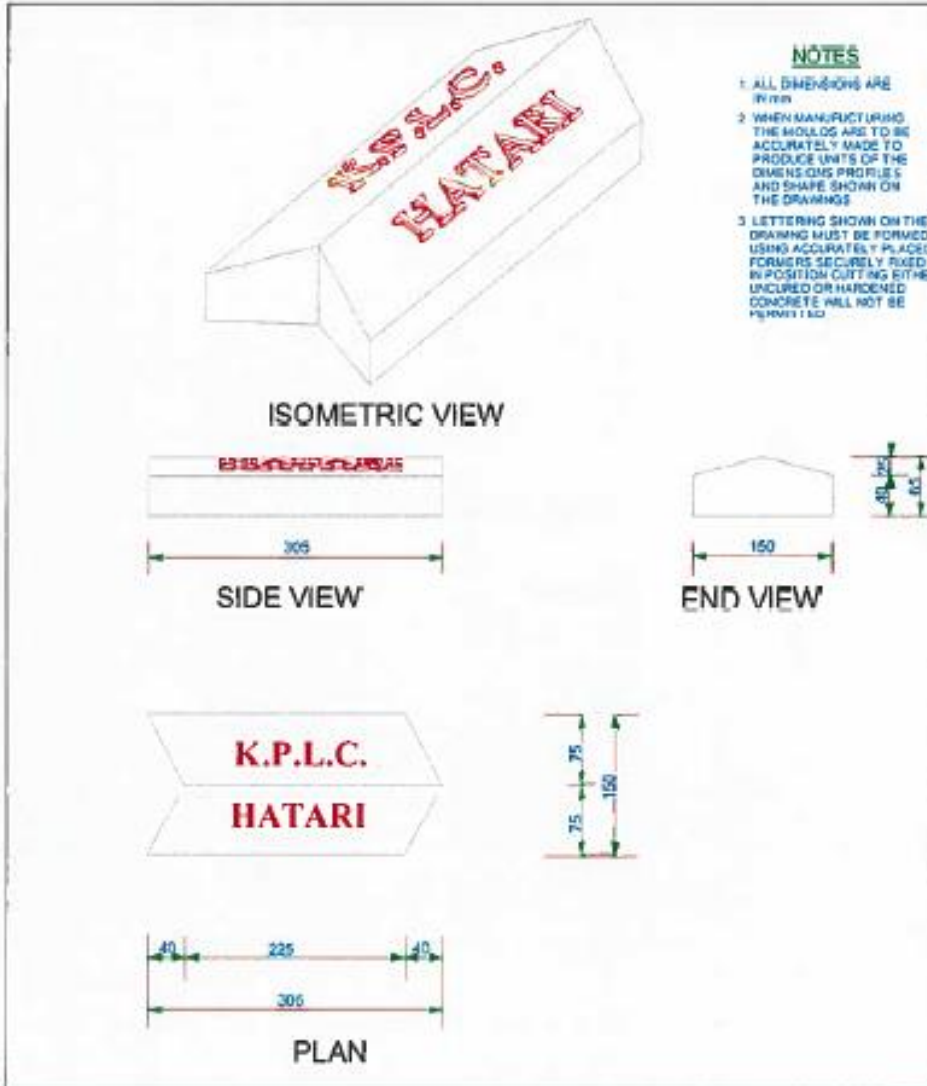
CONCRETE HATARI SLAB TO COVER L.V. CABLES
